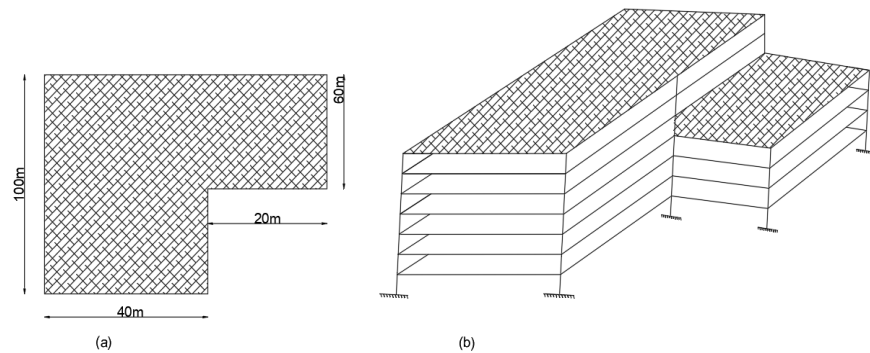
Plan and elevations of unsymmetrical five story structures.
